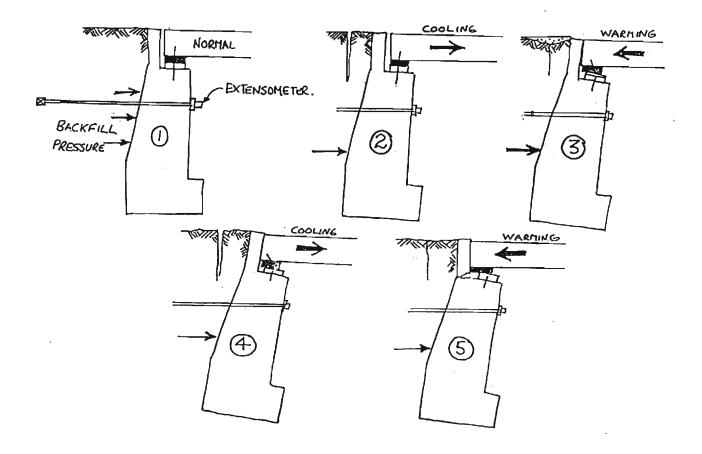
Extensometers for Monitoring Lateral Movements Between Backfill and Abutment
